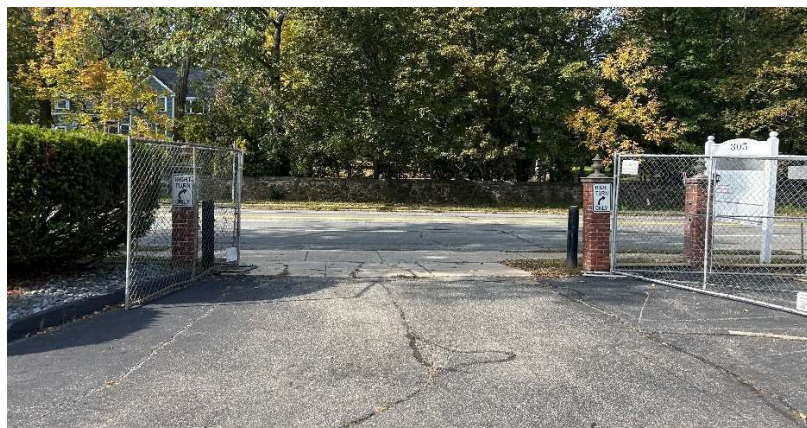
Photo of Existing Right-Out-Only Driveway onto North Main Street (Route 28)
